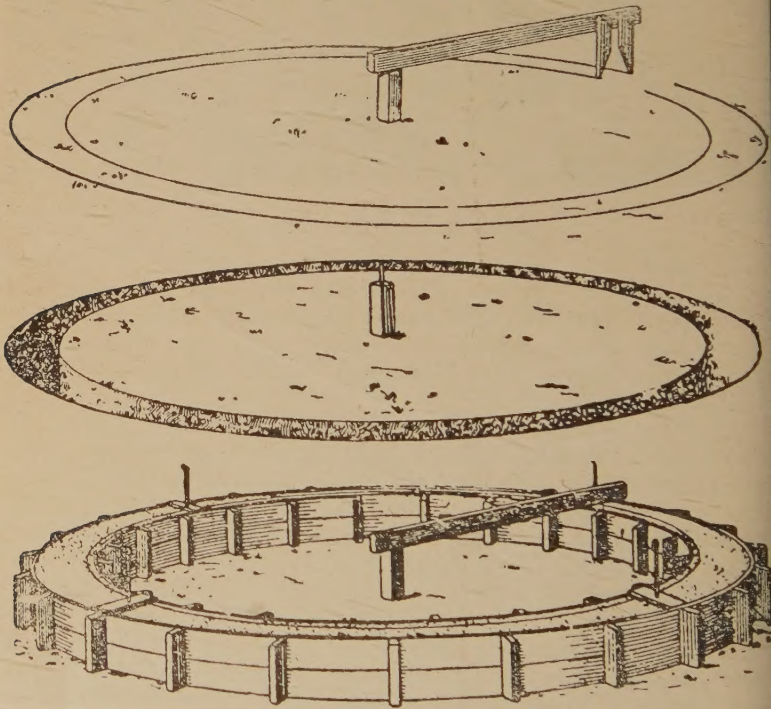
shows the best method of laying off the trench for the foundation of a silo or for the collar of a pit silo. Middle section shows trench dug. Lower section shows foundation forms in place and filled with concrete. The foundation is leveled by a spirit level on the same sweep used in describing the first circle
